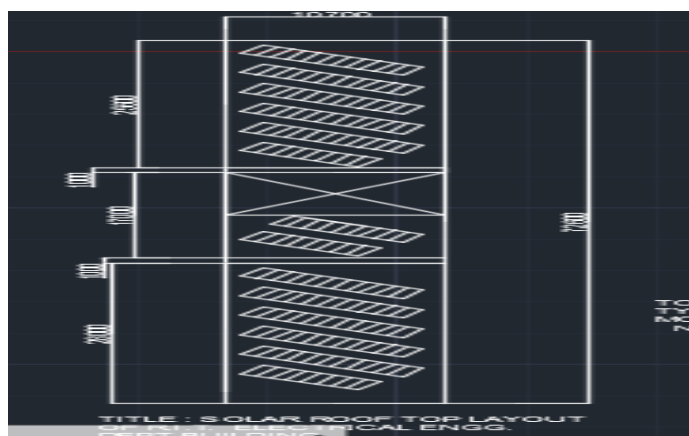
Solar panel rooftop Layout of electrical Engg.Dept
